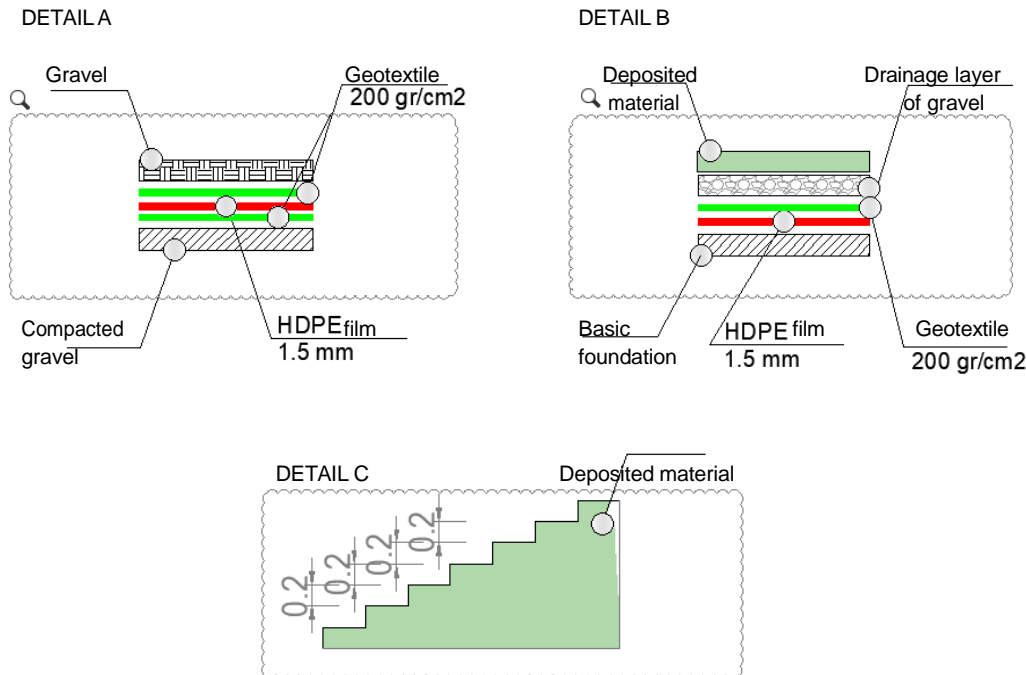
Cross-section through the Landfill for non-hazardous waste showing landscaping details of the initial embankment (detail A), bottom (detail B) and slope of the deposited material (detail C)
